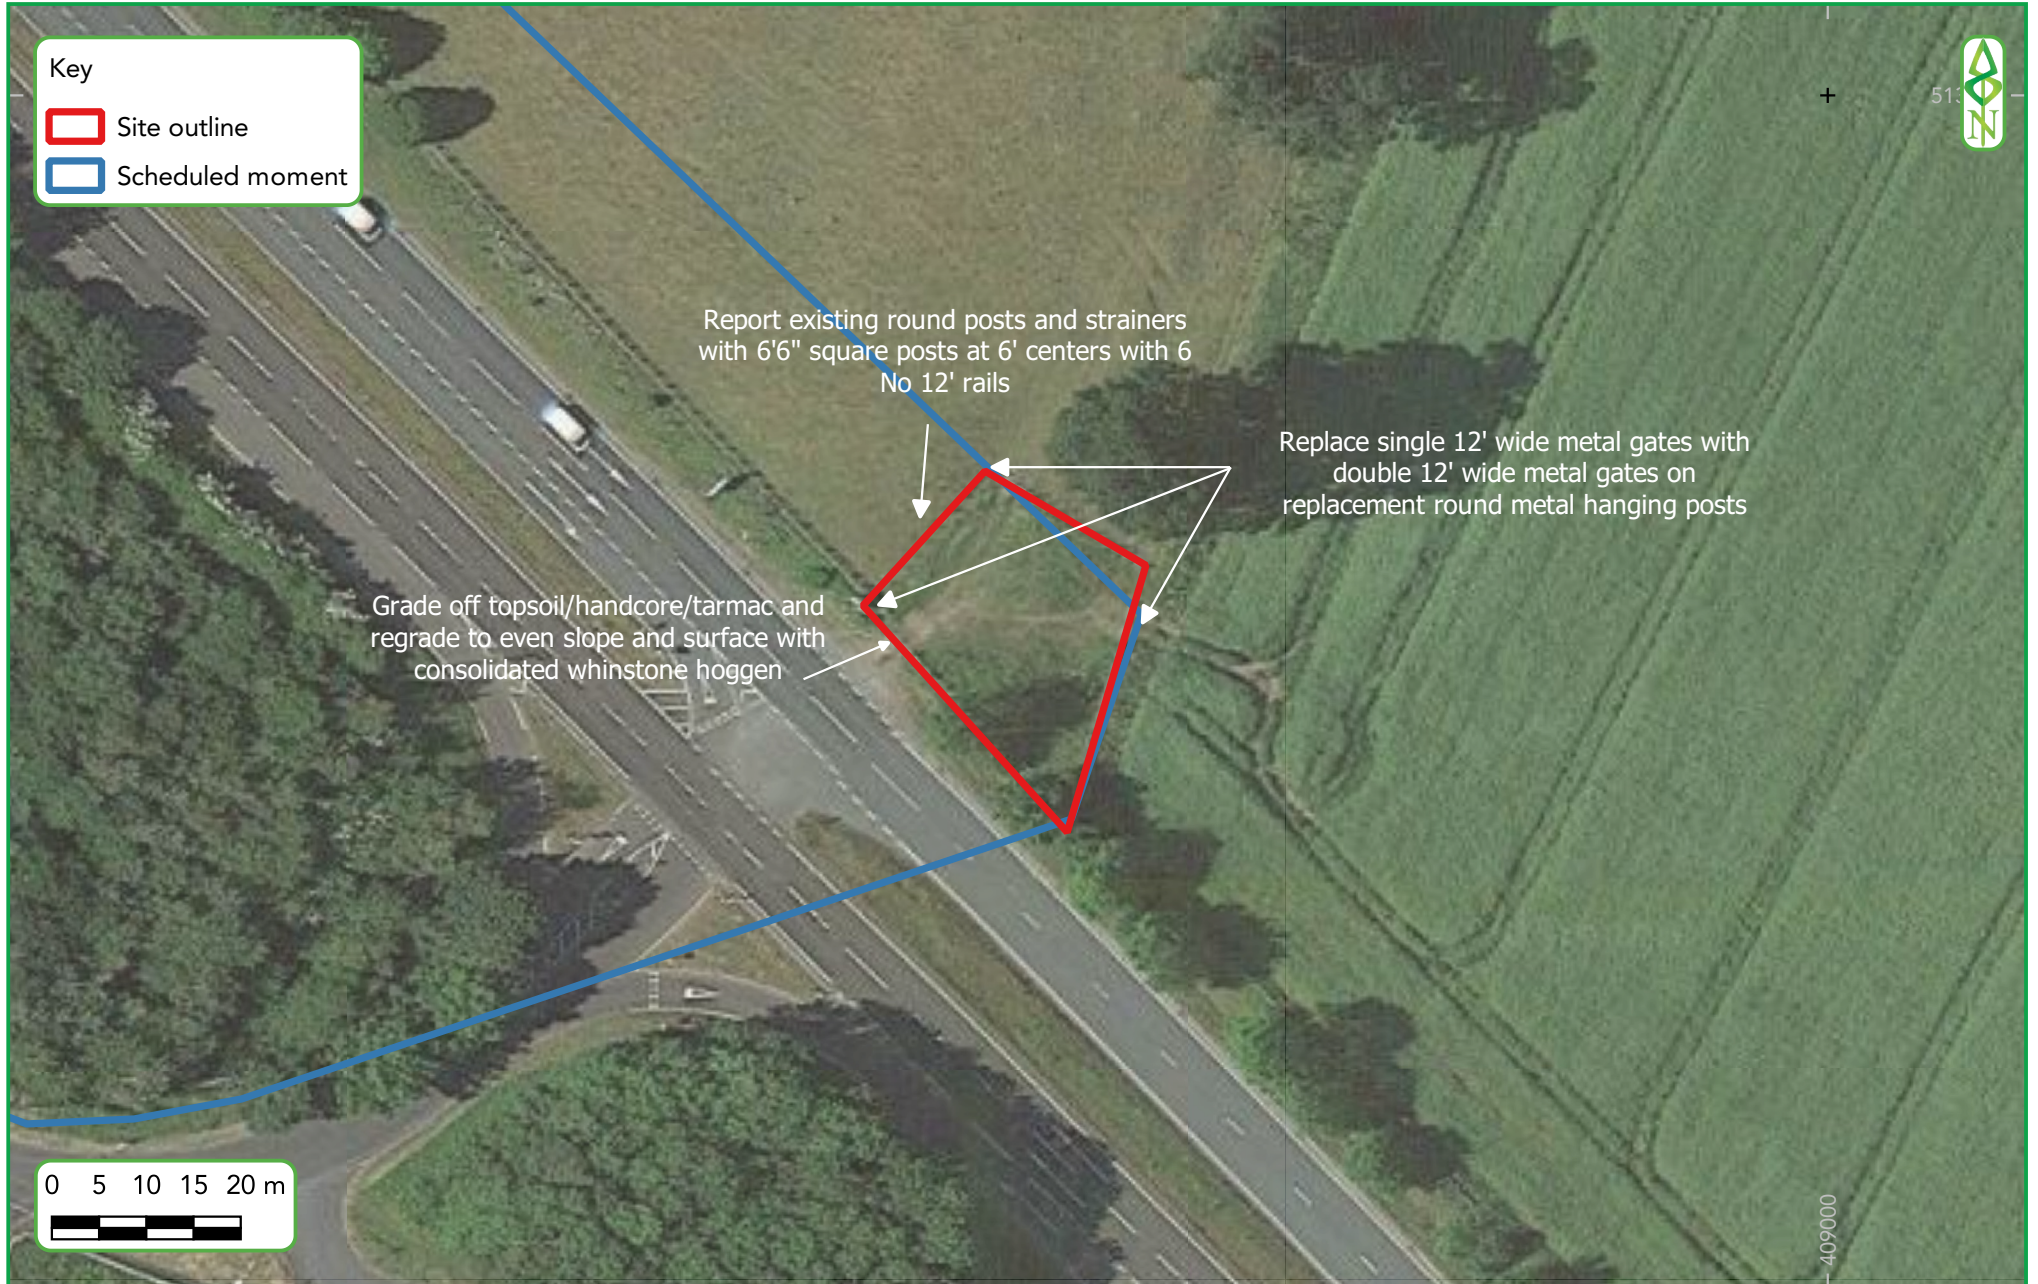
Greta Bridge: Proposed access alterations showing site outline and extent of scheduled area
